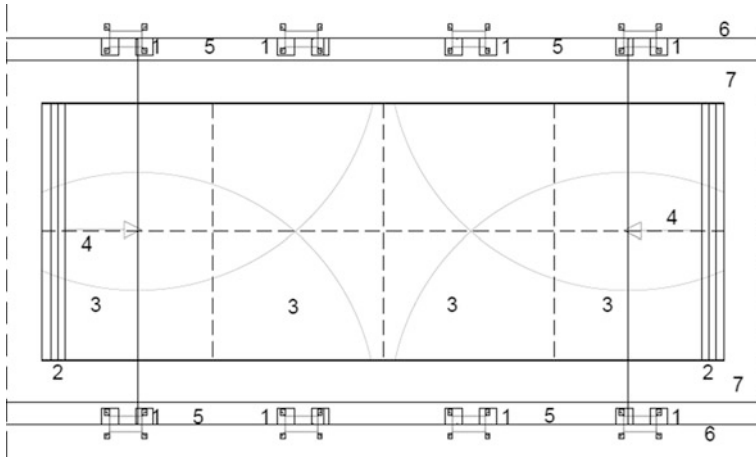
Concrete mixture pumping plan: 1 concrete pump, 2 vibrating screed, 3 concrete pump radius, 4 direction of works, 5 stopping area, 6 temporary road, 7 lean concrete course (Source Own study)
